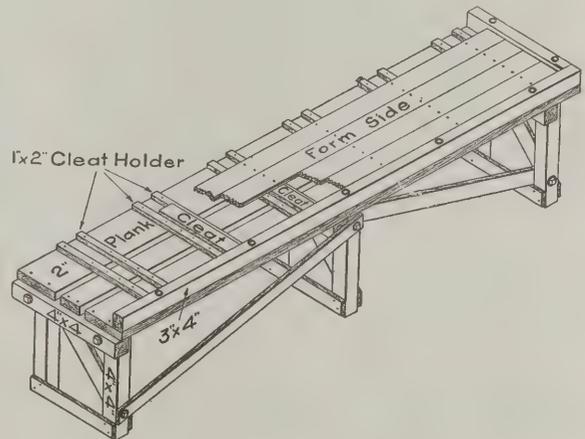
Carpenter's Bench for Making up Forms—All Bolts Shown Are $\frac{3}{4}$ -In.
